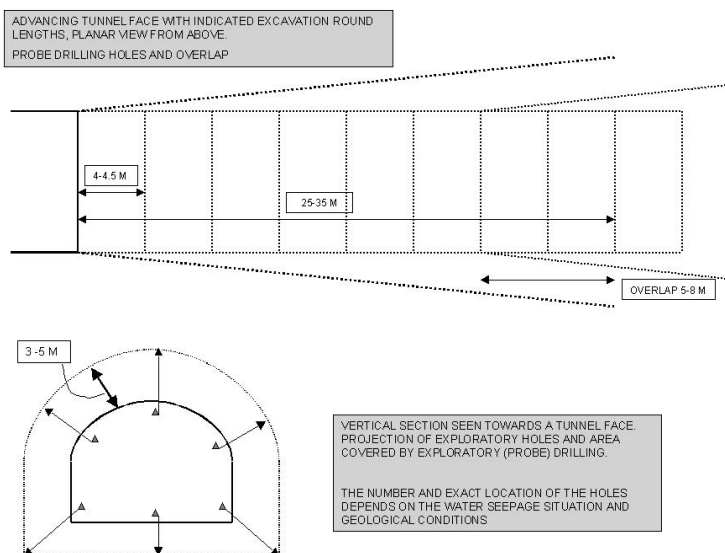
Example of a geometrical layout of a probe drilling fan, planar view from above and vertical section towards the tunnel face.
